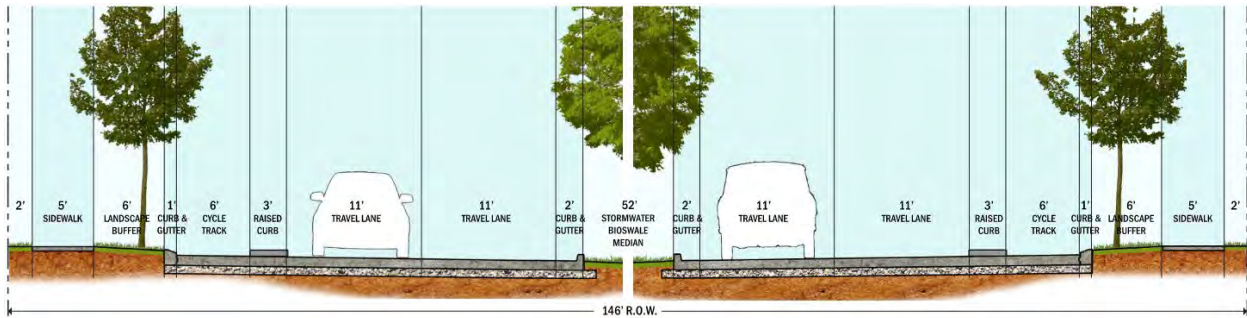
Typical Four-Lane Arterial Roadway Cross Section at Full Build-Out
